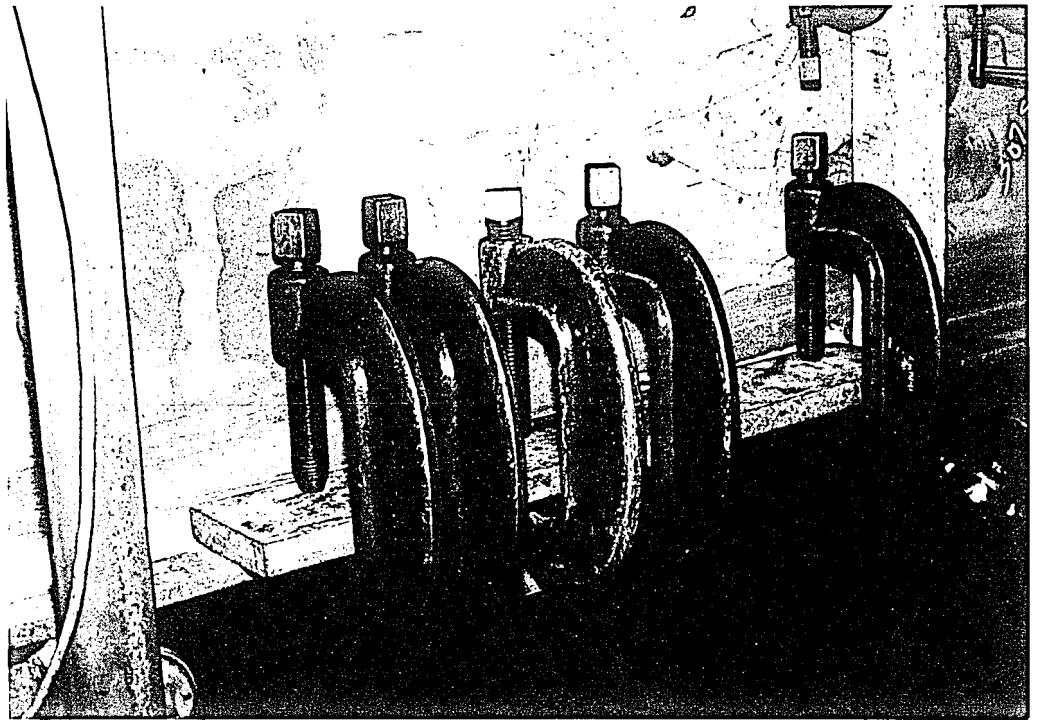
Typical Splice of Groove Welded Test Beam. This Allowed for Continued Testing of Other Details on the Beam.
